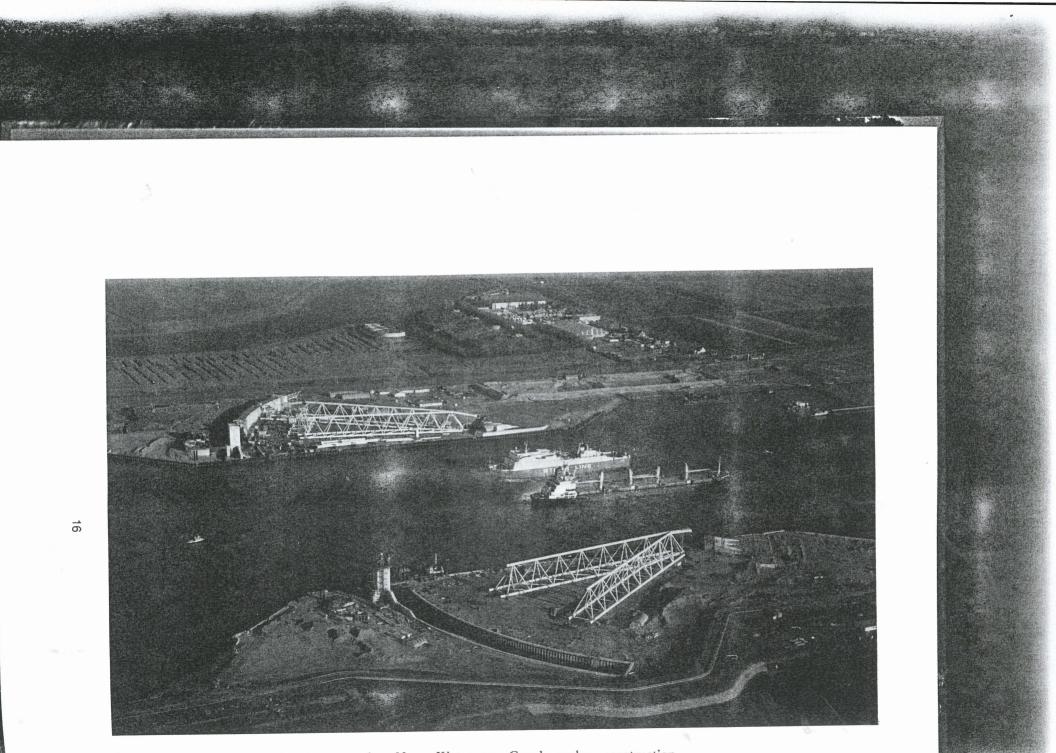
Storm surge barrier on the New Waterway Canal under construction
